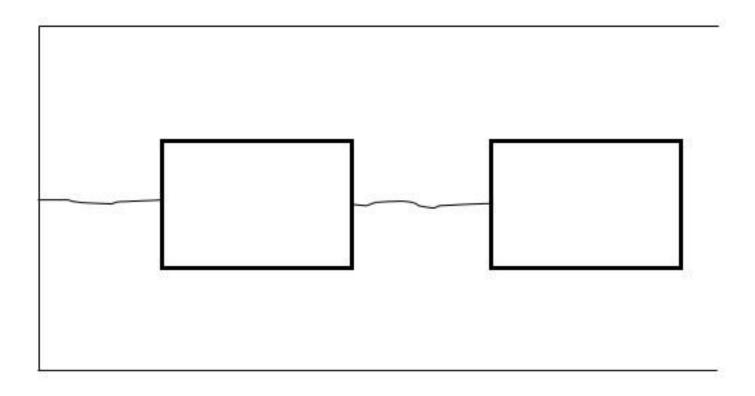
Masonry Wall Piers Failure Mode: Out-of-plane bending (horizontal mid-span cracking) Cause: Insufficient block, joint mortar, or grout compressive strength or, too few rebars or rebar slippage due to inadequate compaction. Other Failure Modes and Causes:
